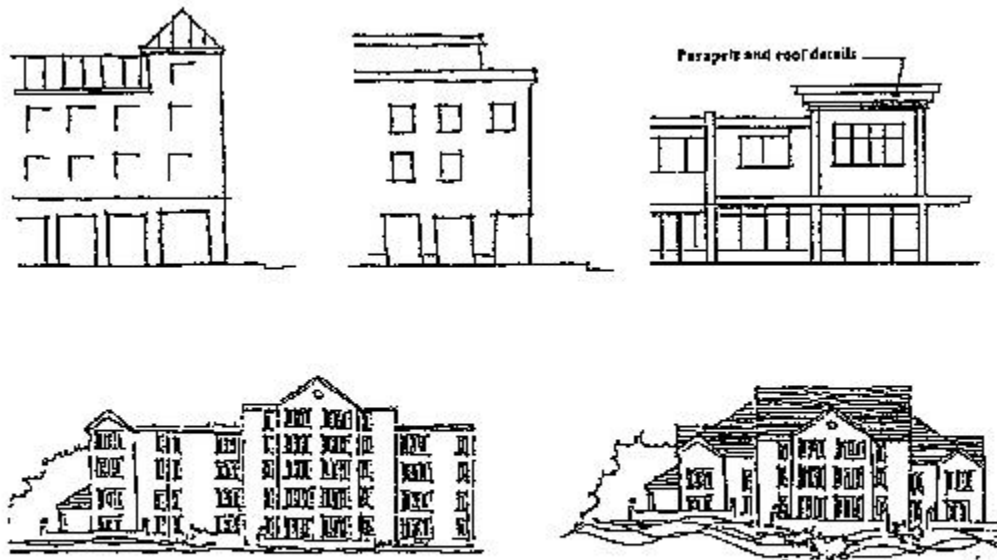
A – Examples of non-parking structure roof designs.
